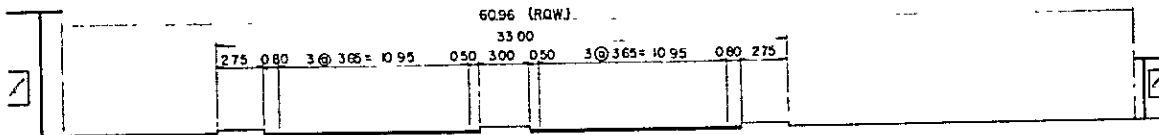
WIDENED CROSS SECTION OF VIA BOLIVAR
